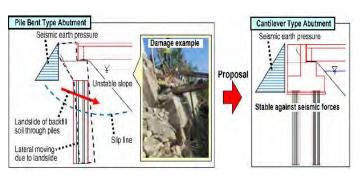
Pile Bent Type Abutment and its Damage
